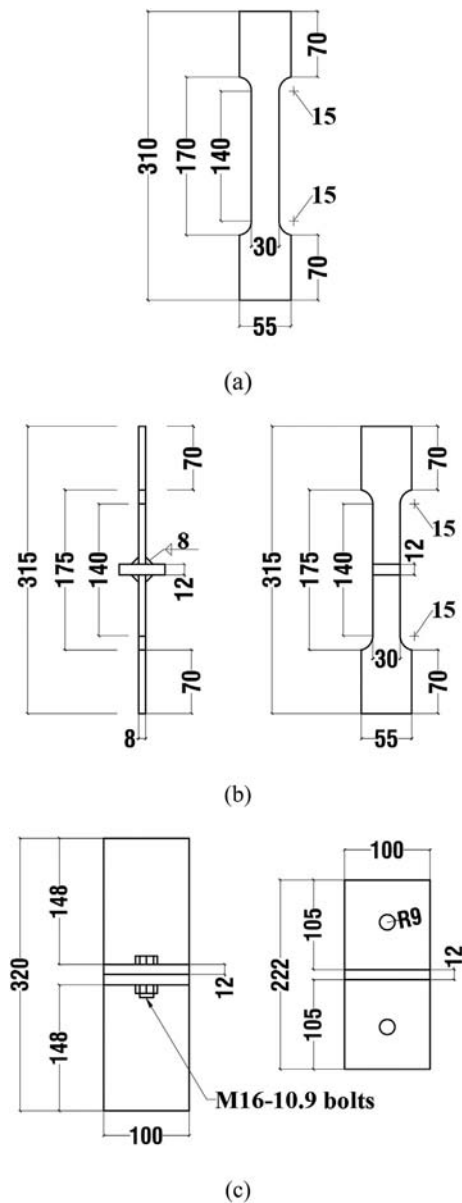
Detailed size diagrams of the material characterization specimens (Note: All dimensions are measured in mm): (a) Coupon test; (b) Welded T-stub test; (c) Bolted T-stub.
